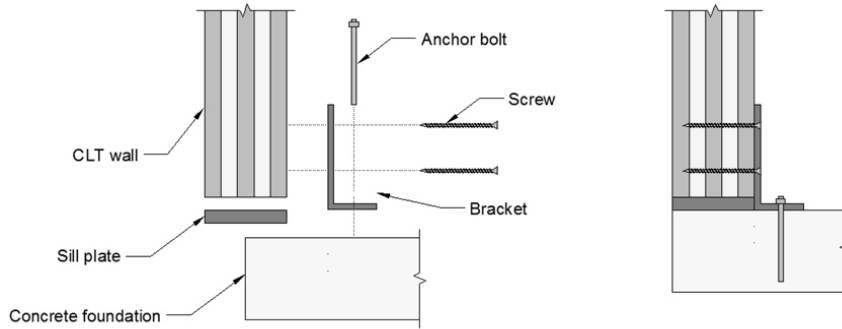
Angle bracket connection between foundation and CLT wall.
